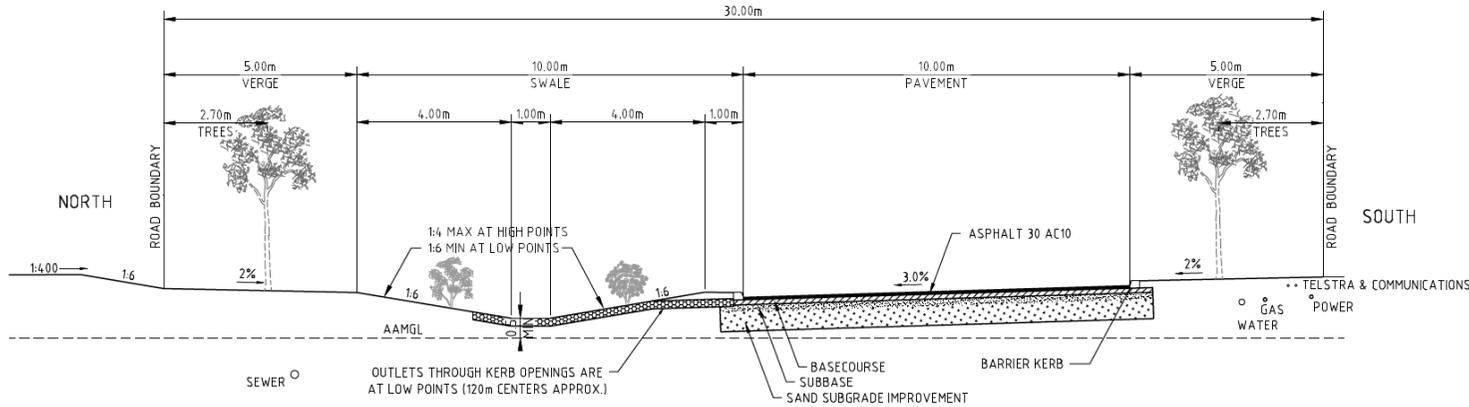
Proposed Other Roads Cross-Section – 30m wide Road Reserve with Roadside Drain
